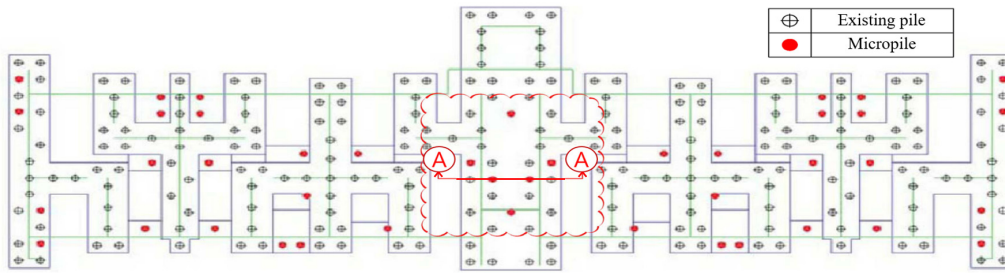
Plane Section of Reinforced Foundation Pile (KICT, 2014)
